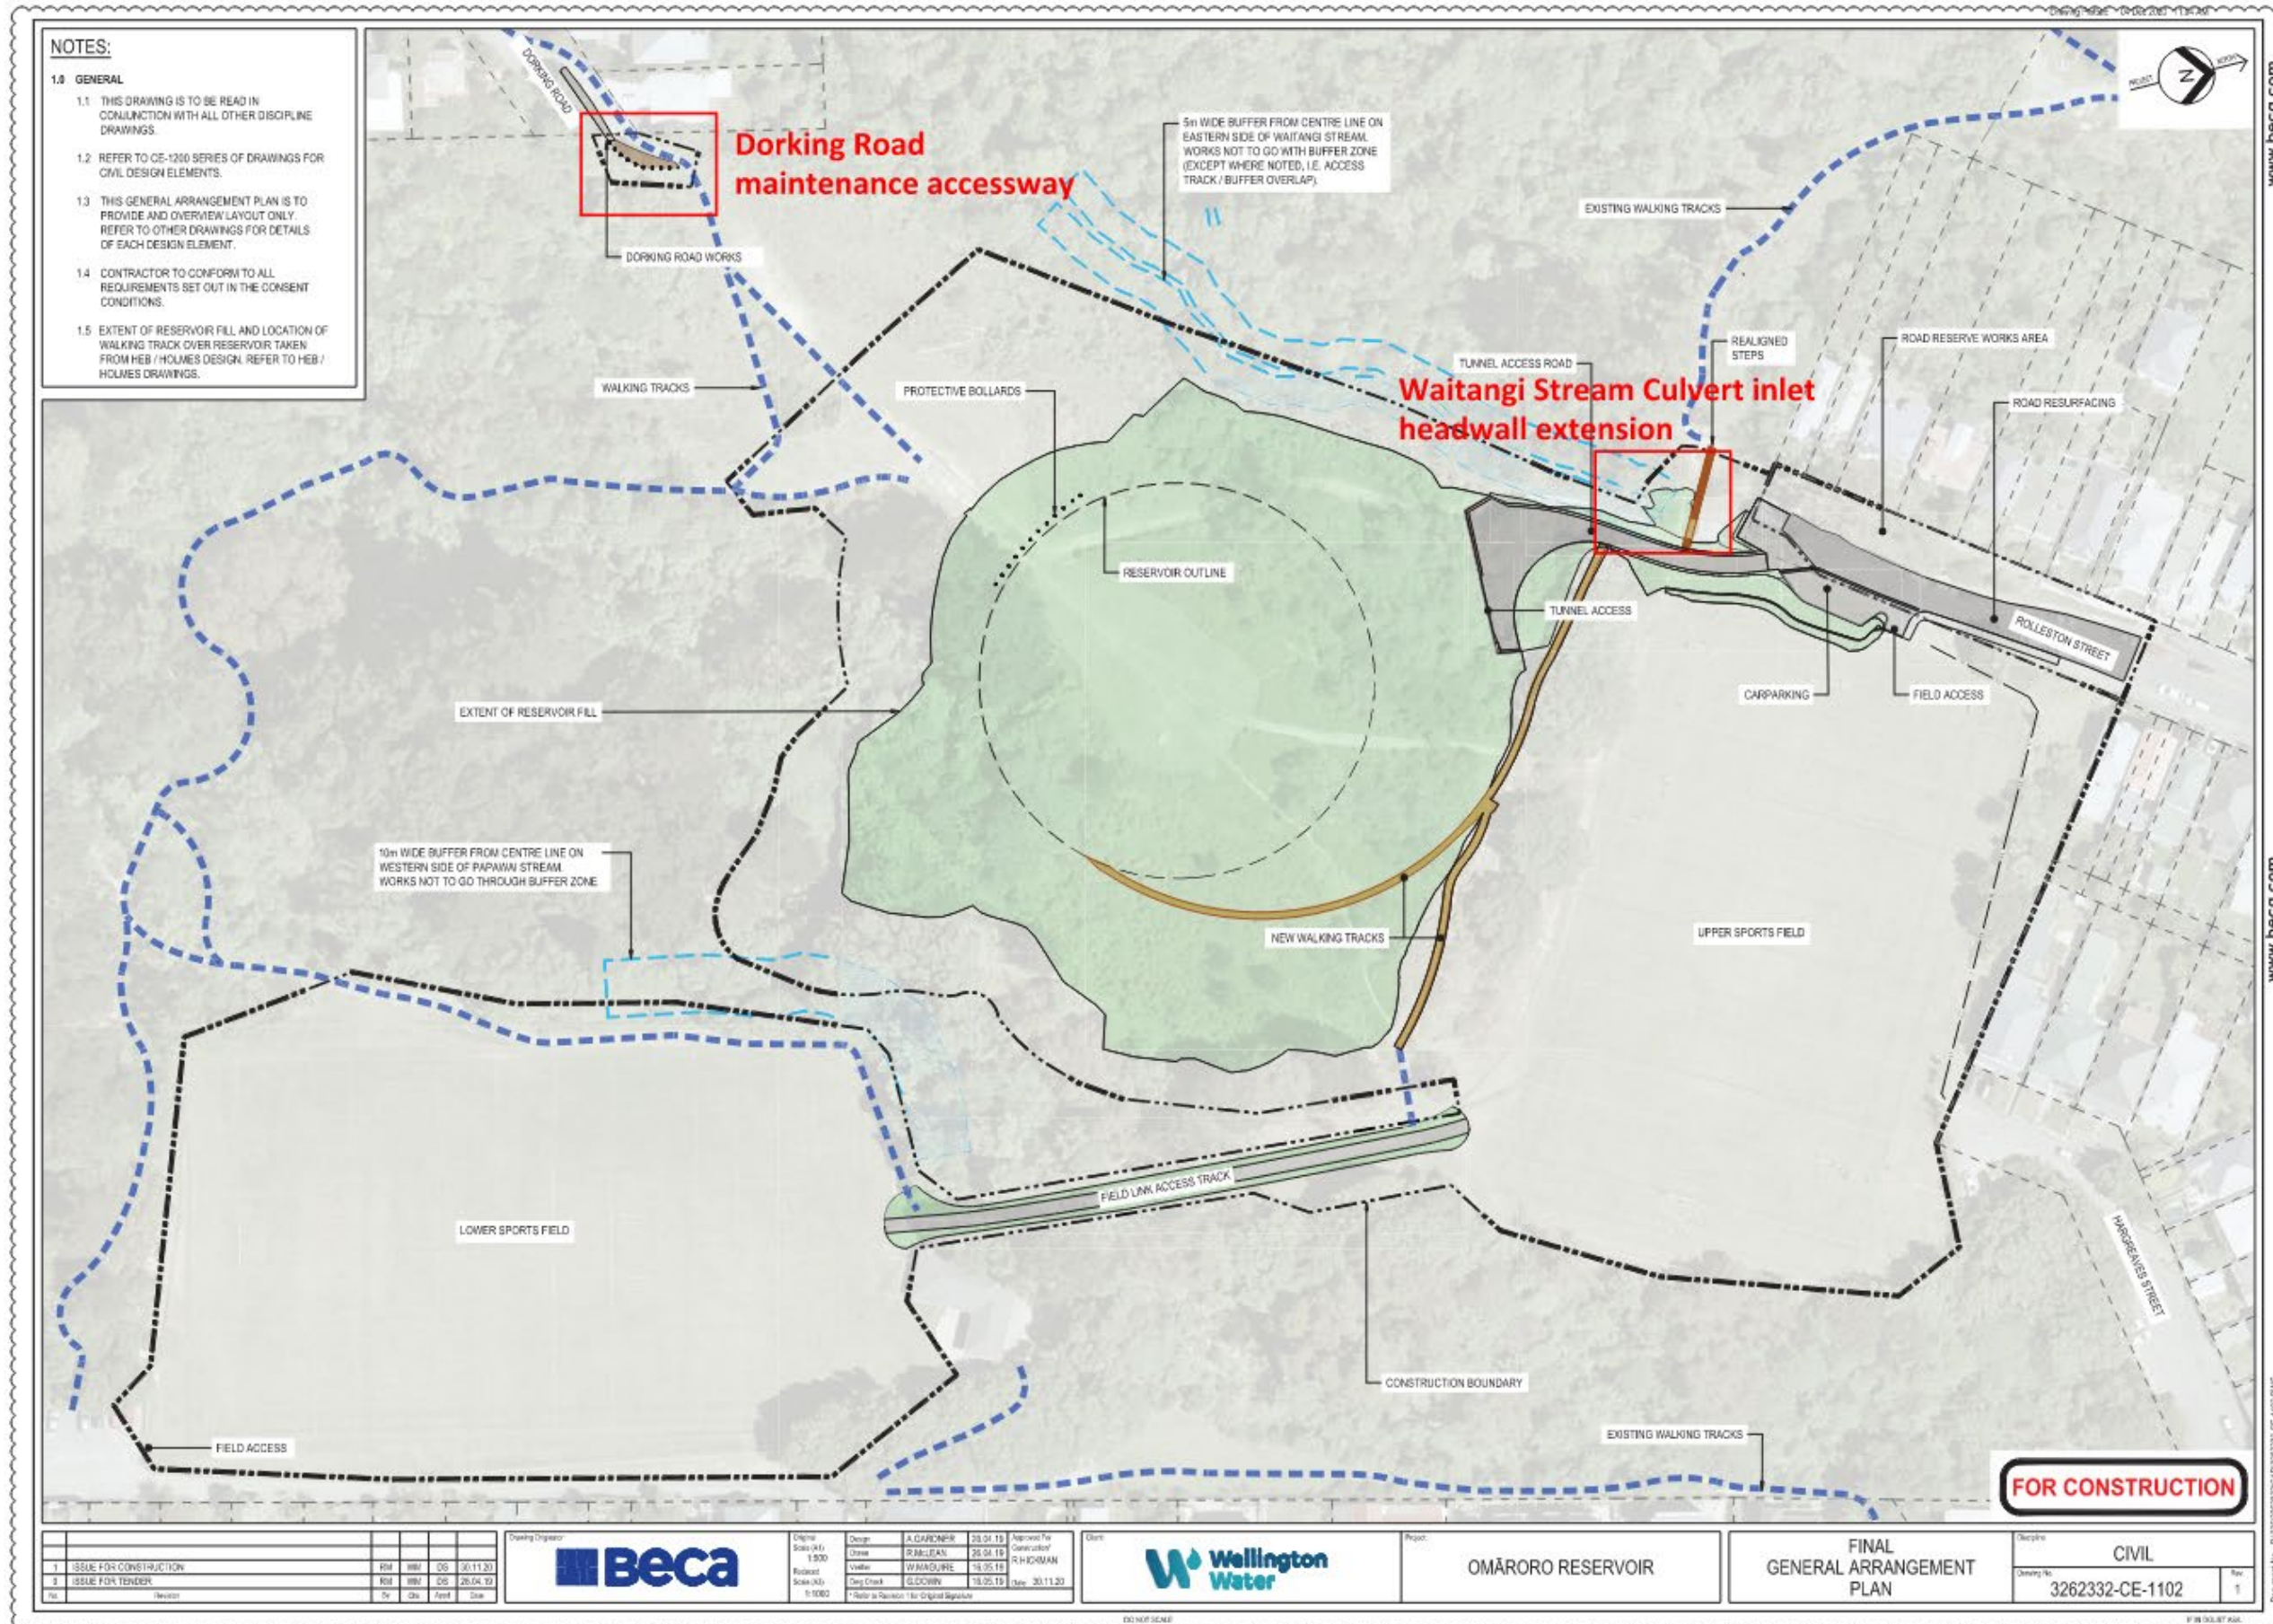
A: Location of two separate areas of construction scope including an extension to the Waitangi Stream culvert headwall area and the Dorking Road maintenance accessway/entrance
